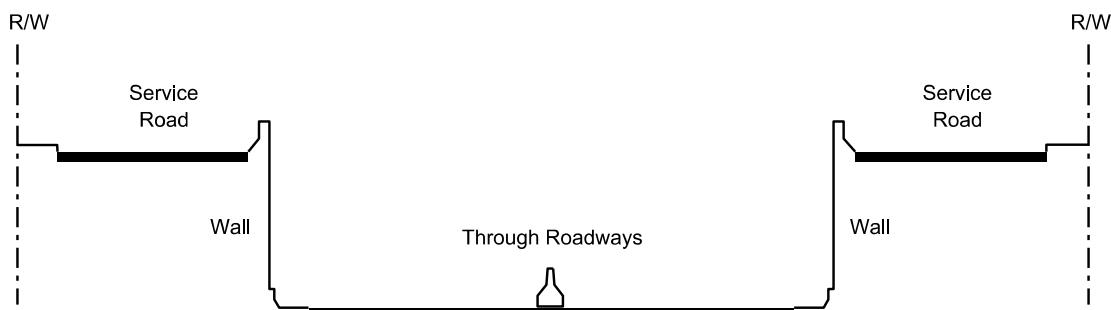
(b) illustrates a depressed freeway with retaining walls in restricted right-of-way. Although the restricted cross section shown is acceptable, it should be used only where additional right-of-way would be extremely costly or where this type of cross section is necessary to preserve the surrounding environment.
